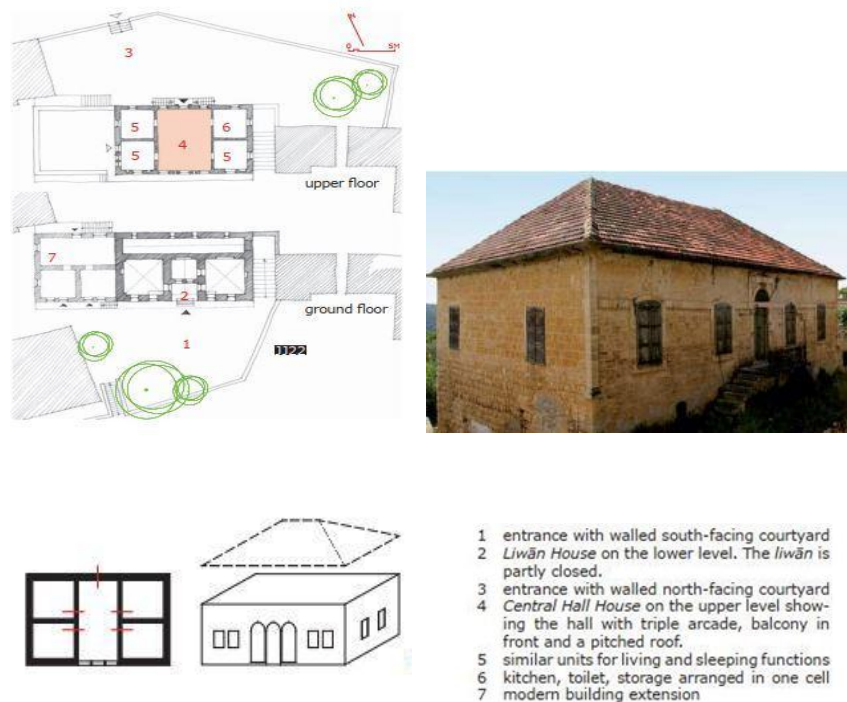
Plans and elevations of Central hall house with pitched roof. Source: M. Wesam AL ASALI, Iyas SHAHI. Date: 2016.
